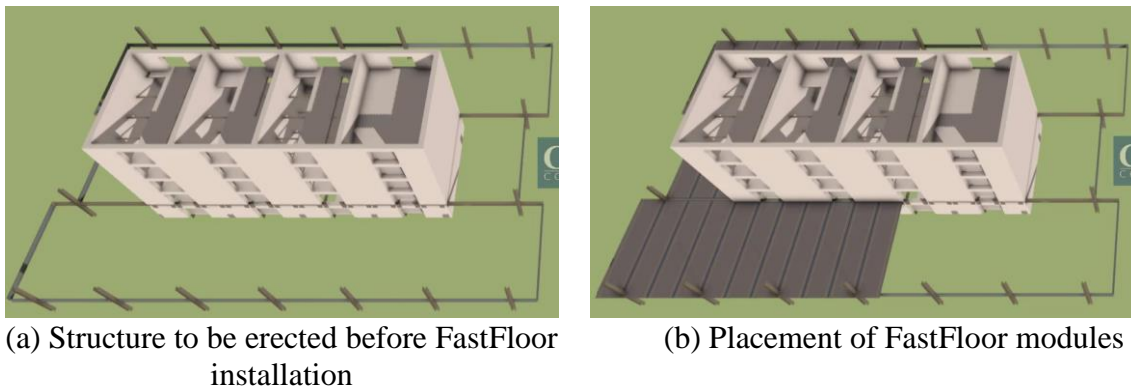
Construction sequence for FastFloor. From video by [Clark Construction, 2022]
